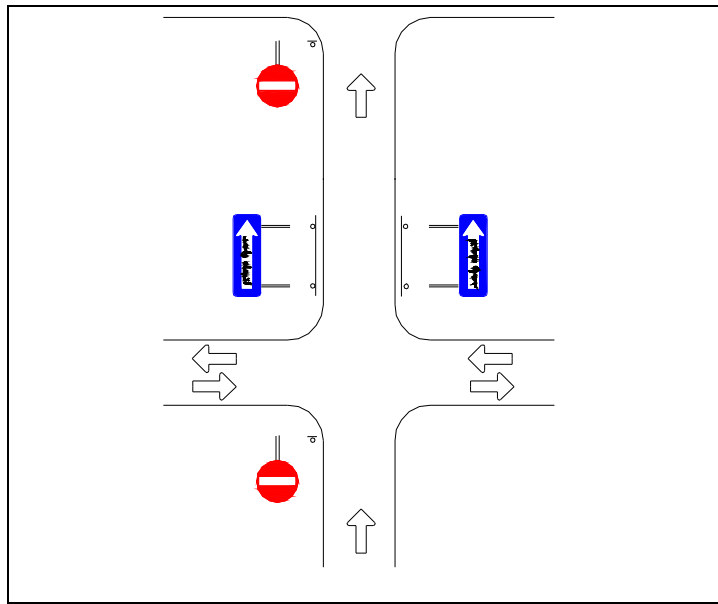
,٦,١a A two-way traffic road intersecting a one-way road.
